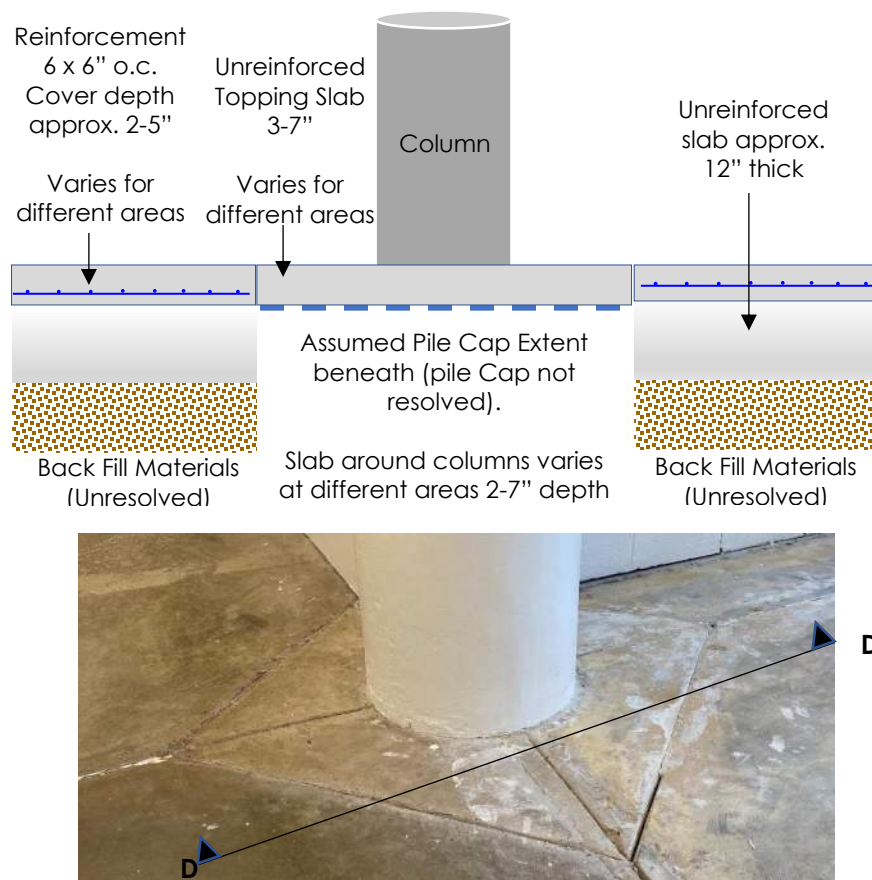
Top: Schematic Section D-D through Ground Floor and Column Base
